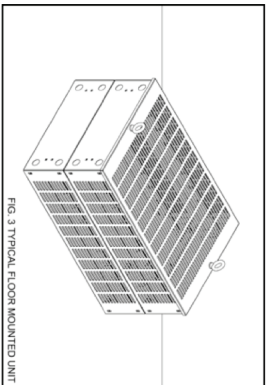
TYPICAL FLOOR MOUNTED UNIT
